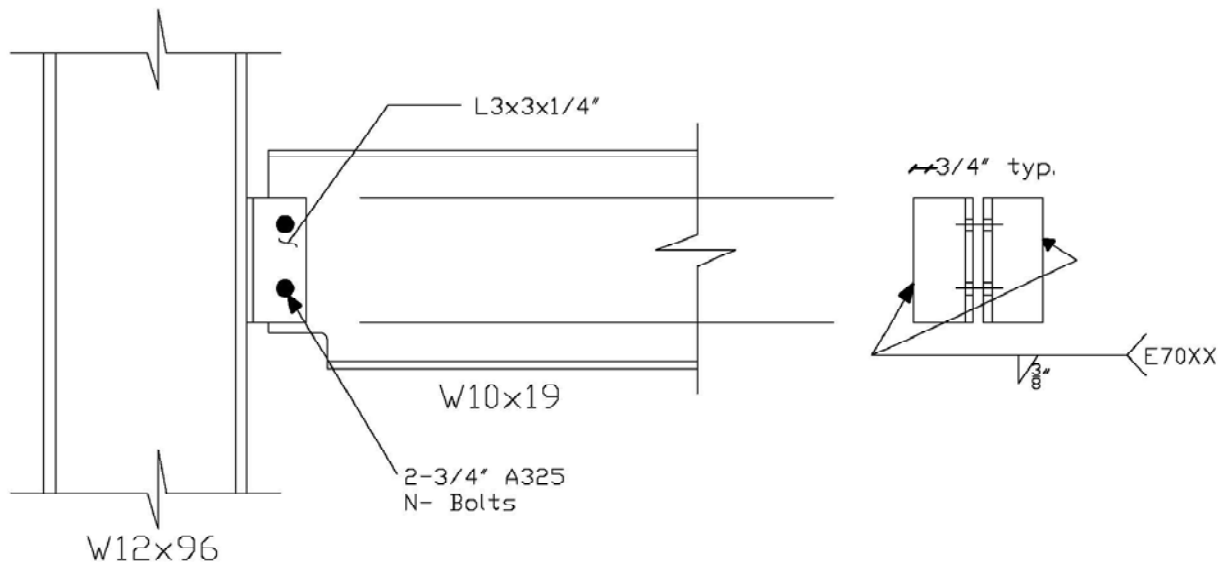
Bolted/welded double angle connection at beam web-column flange location
